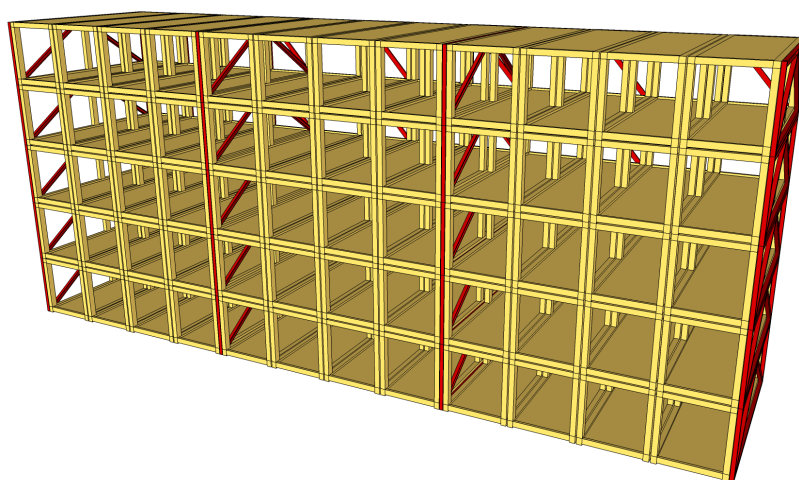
Case study building of a timber modular building comprised of three subsequent building sections
